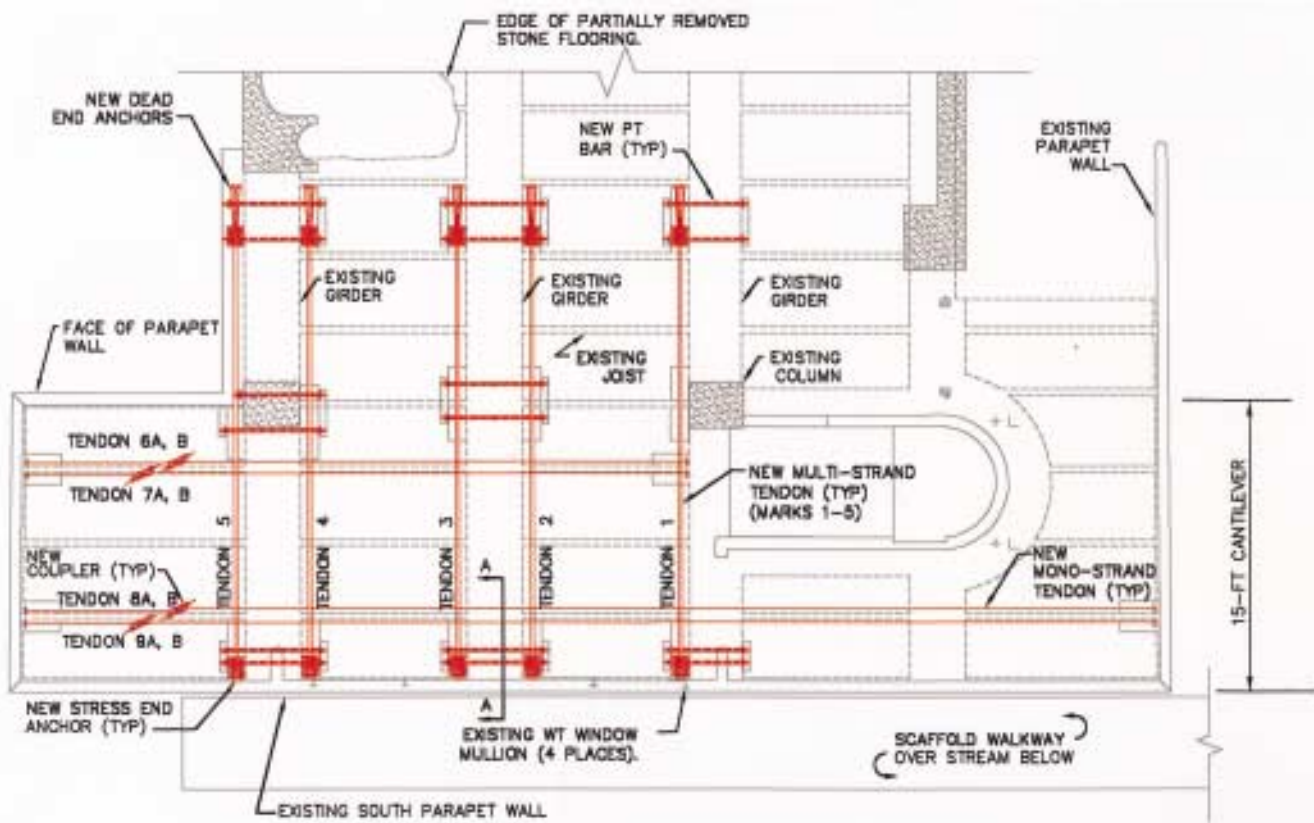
FIRST FLOOR TENDON LAYOUT
